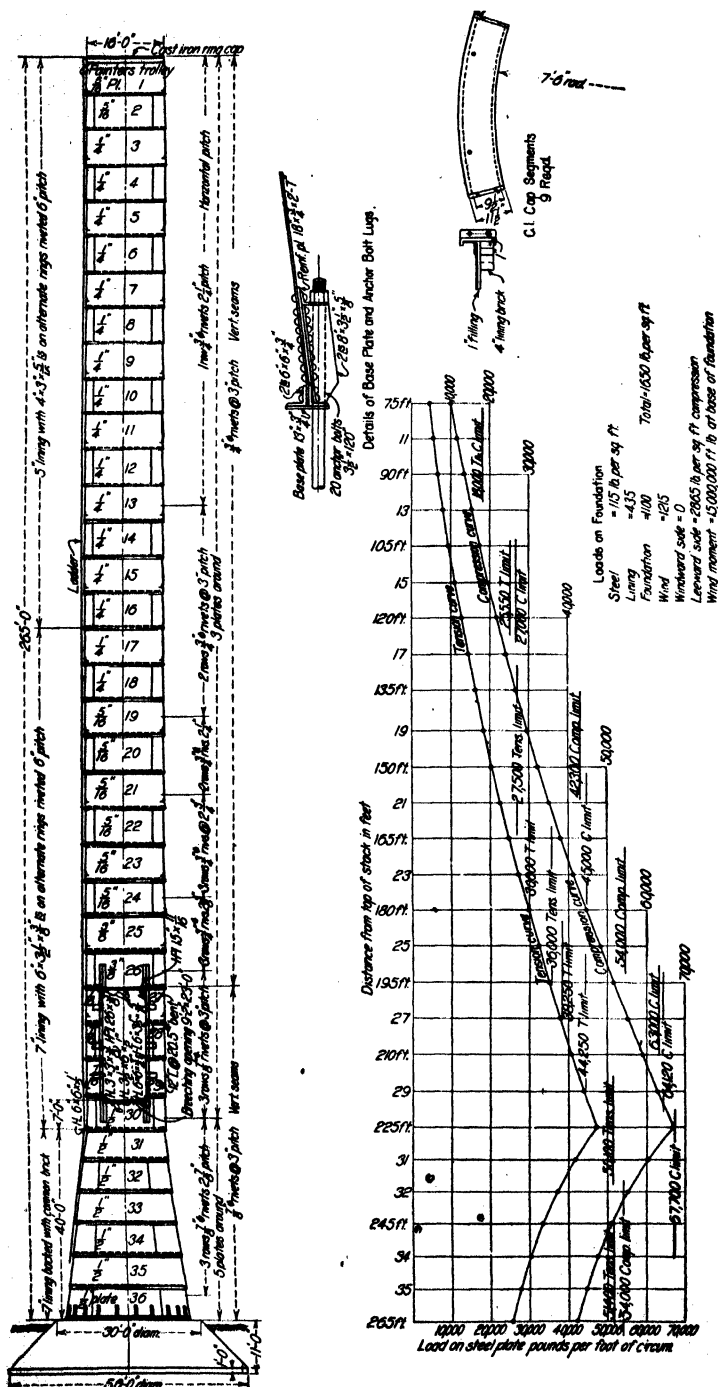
Self-supporting 265-ft. steel chimney—general design sheet.
